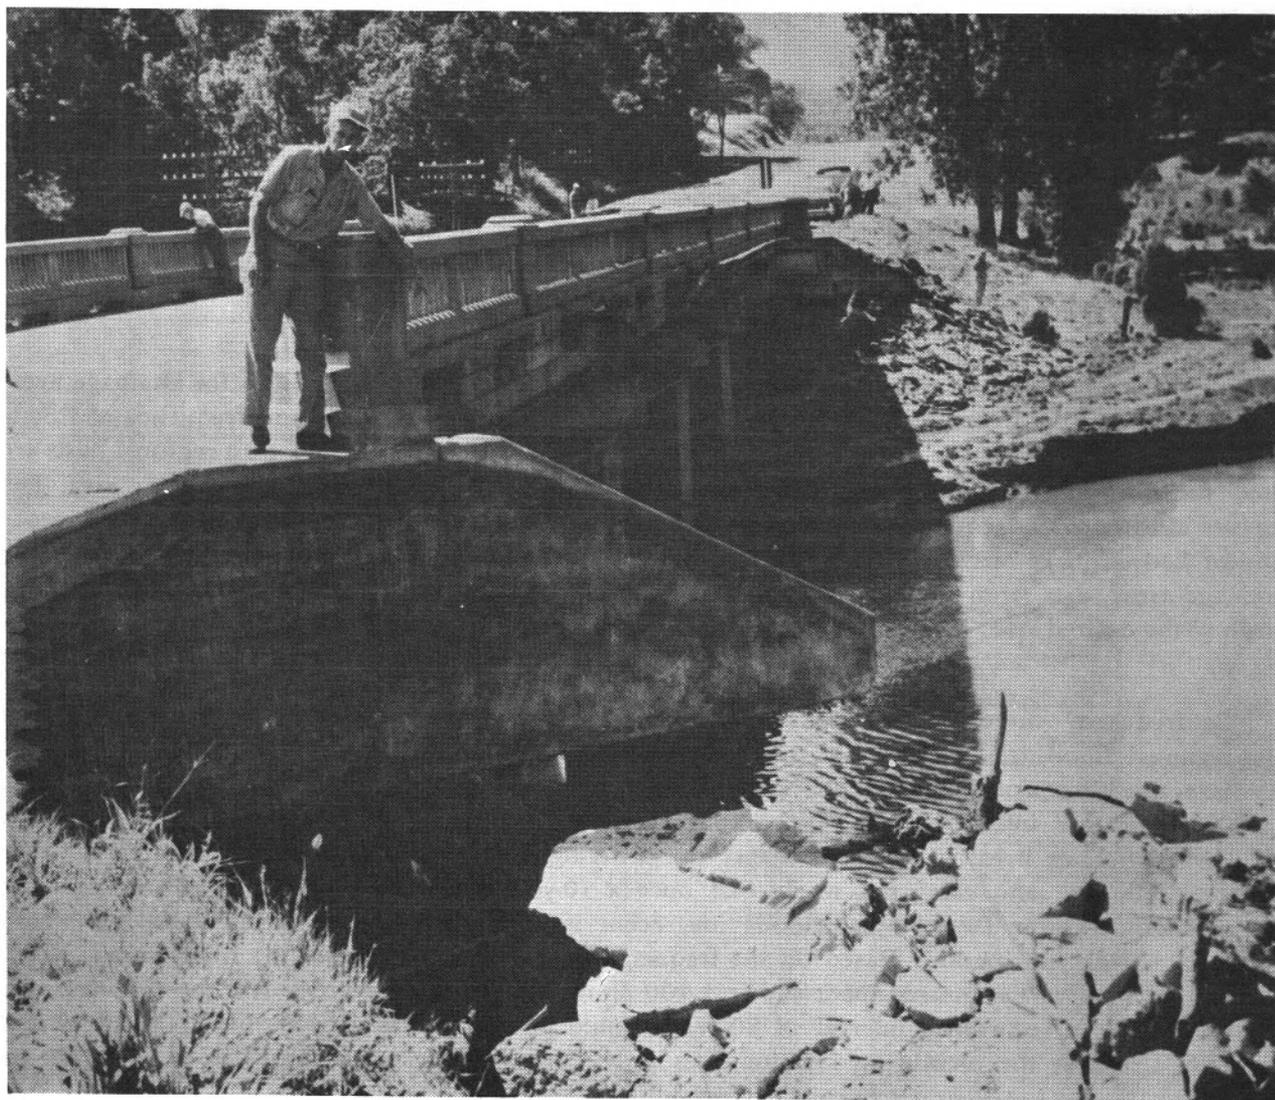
View of damaged bridge over Isle du Bois Creek at U. S. Highway 61 crossing. Note complete wash-out of left abutment fill and under highway.
